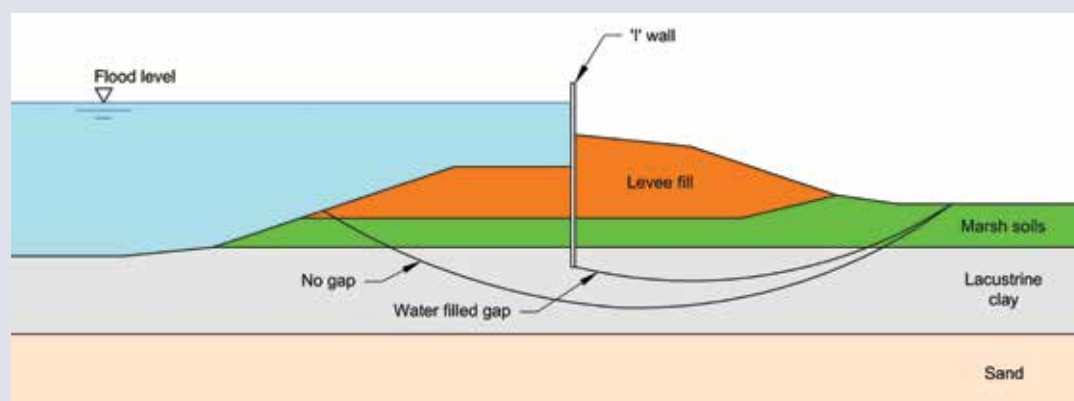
Failure of I-wall structure, New Orleans (after Brandon *et al.*, 2008)
